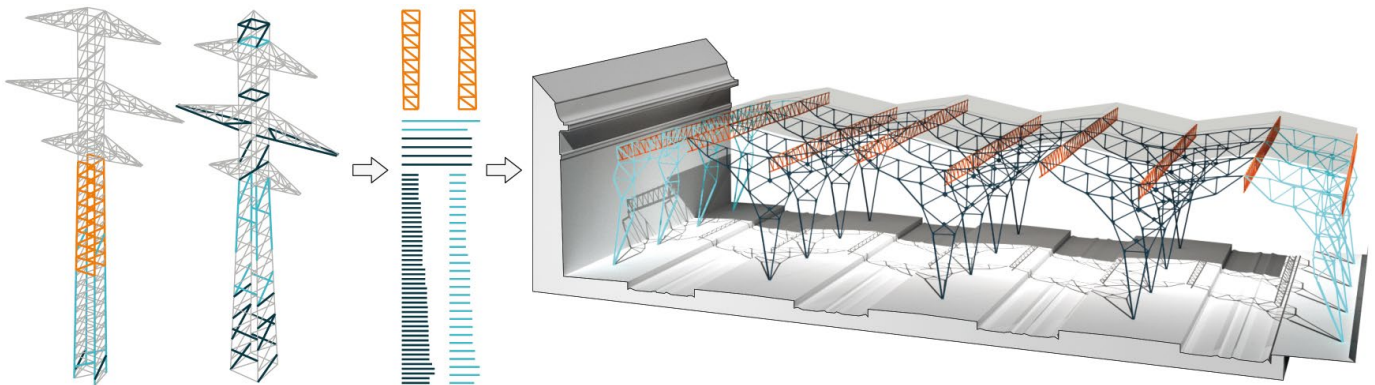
Reuse of bars from obsolete electric pylons in a new roof structure for a train station: automated bar selection, structural form-finding, and bar assignment [13]
